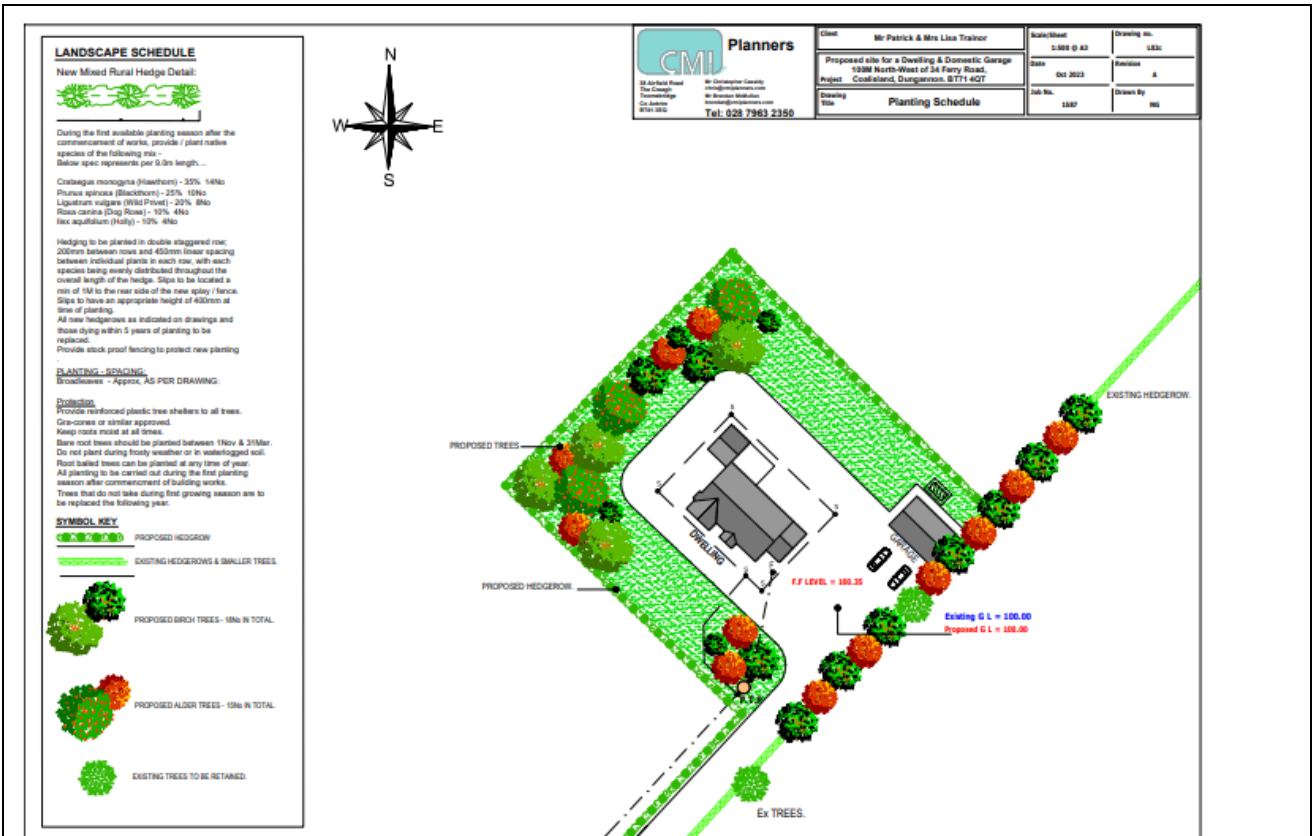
Block plan of dwelling and garage currently proposed, including revised landscaping plan
